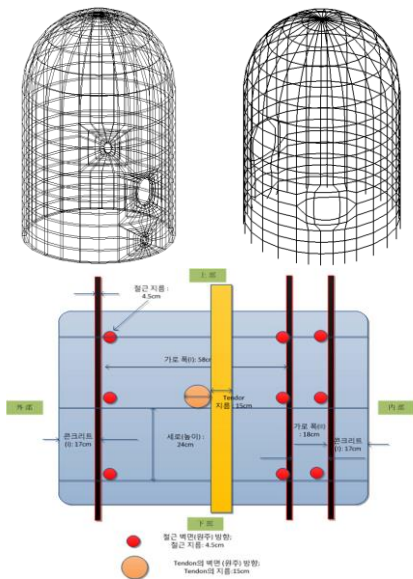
Steel structure of reinforced concrete (RC) with tandom of CB for Wulsung Unit 1
